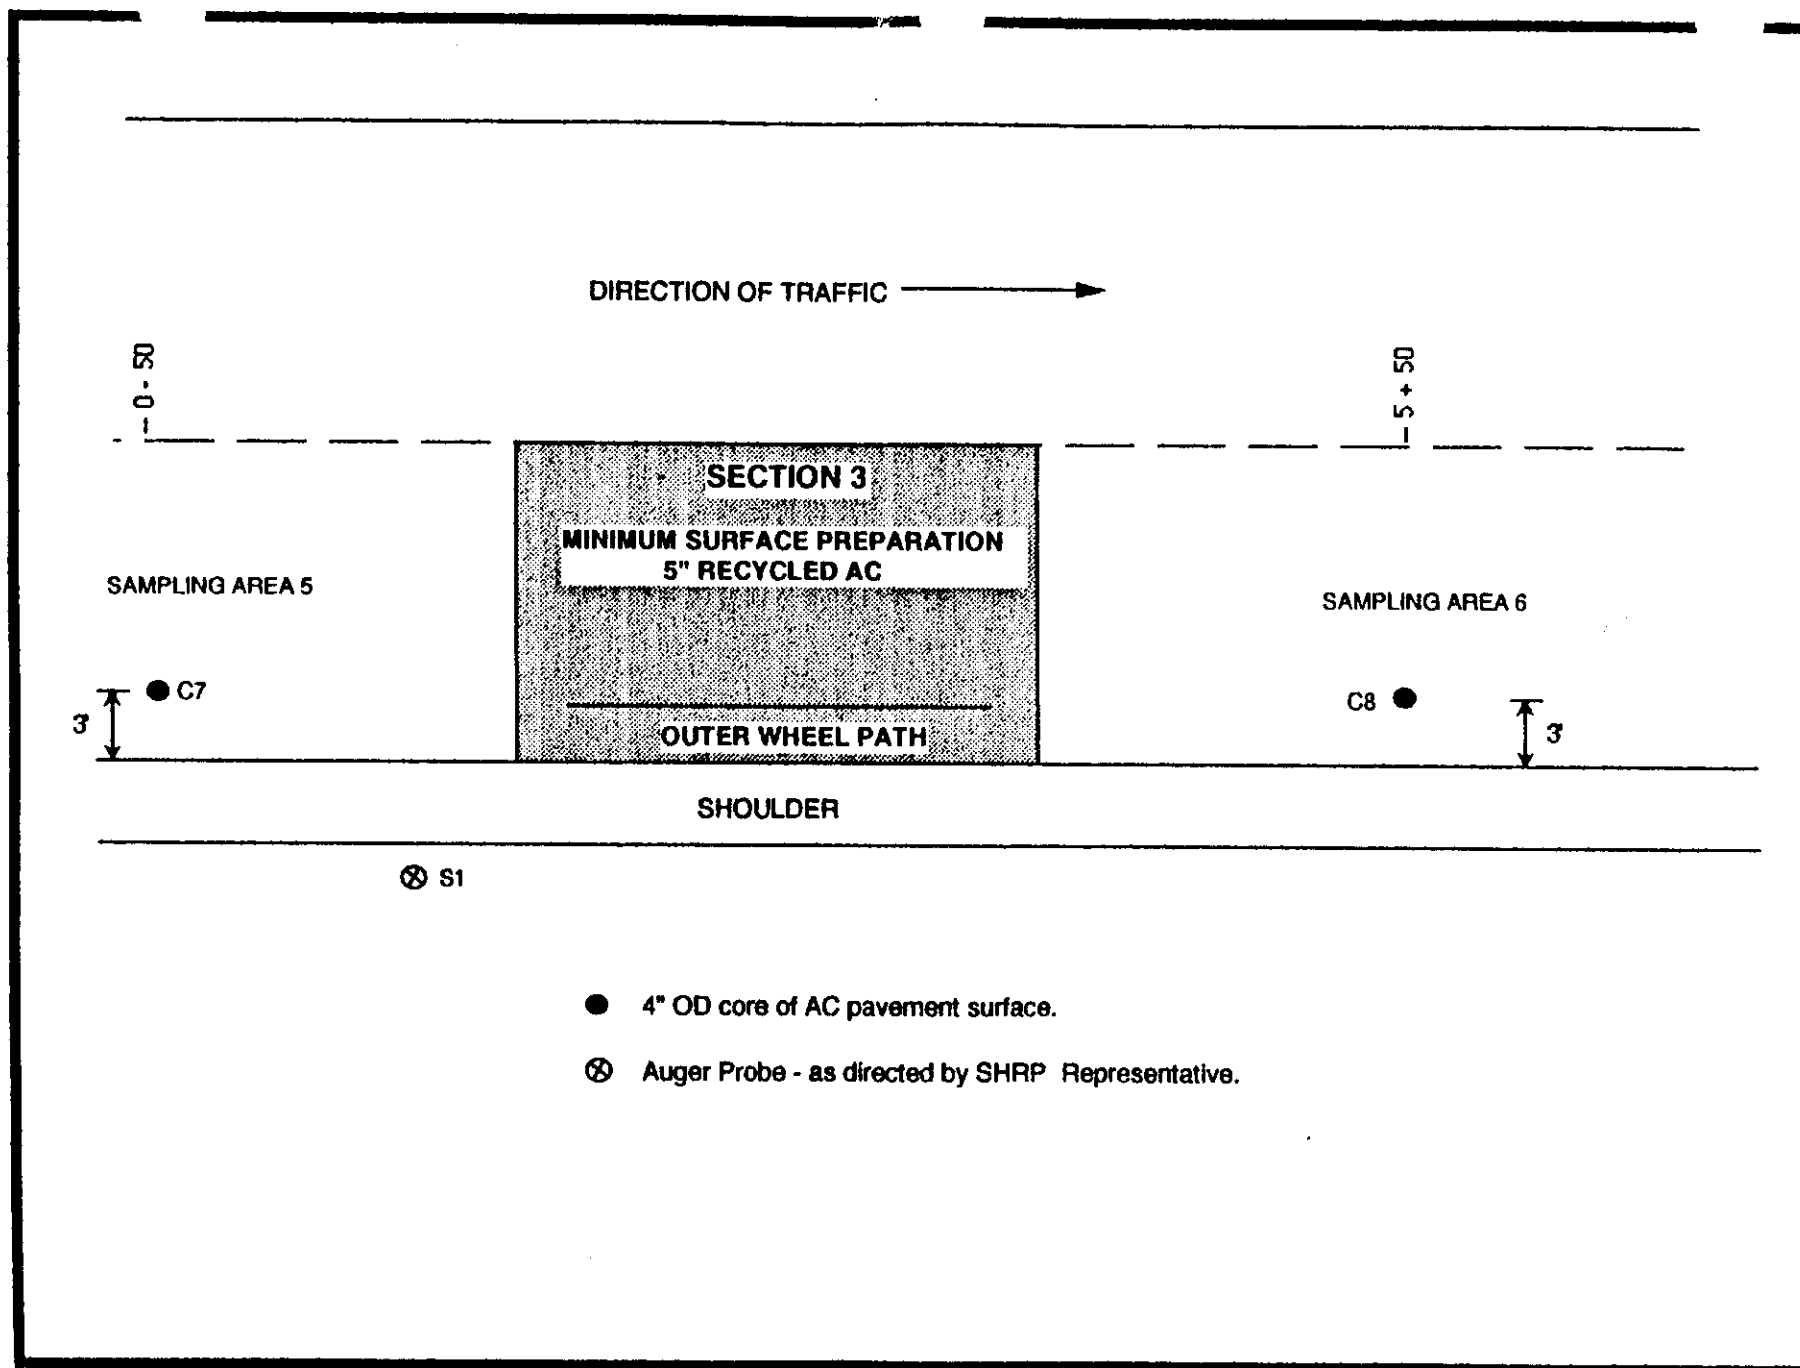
Example of "Pre-Construction" Sampling Plan for Section 3.
